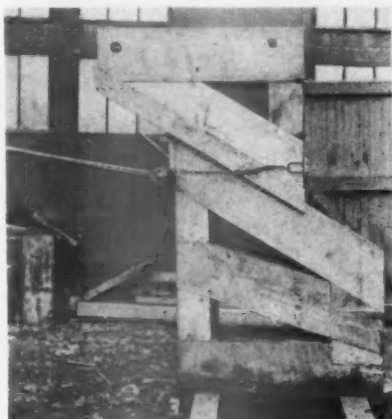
Third type of roof control machine, built in the shape of a crib
